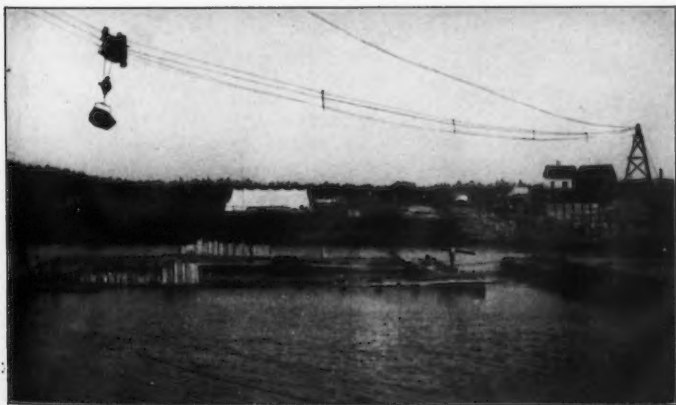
BUILDING COFFER-DAM OF PIER 3, SHOWING CABLEWAY.
